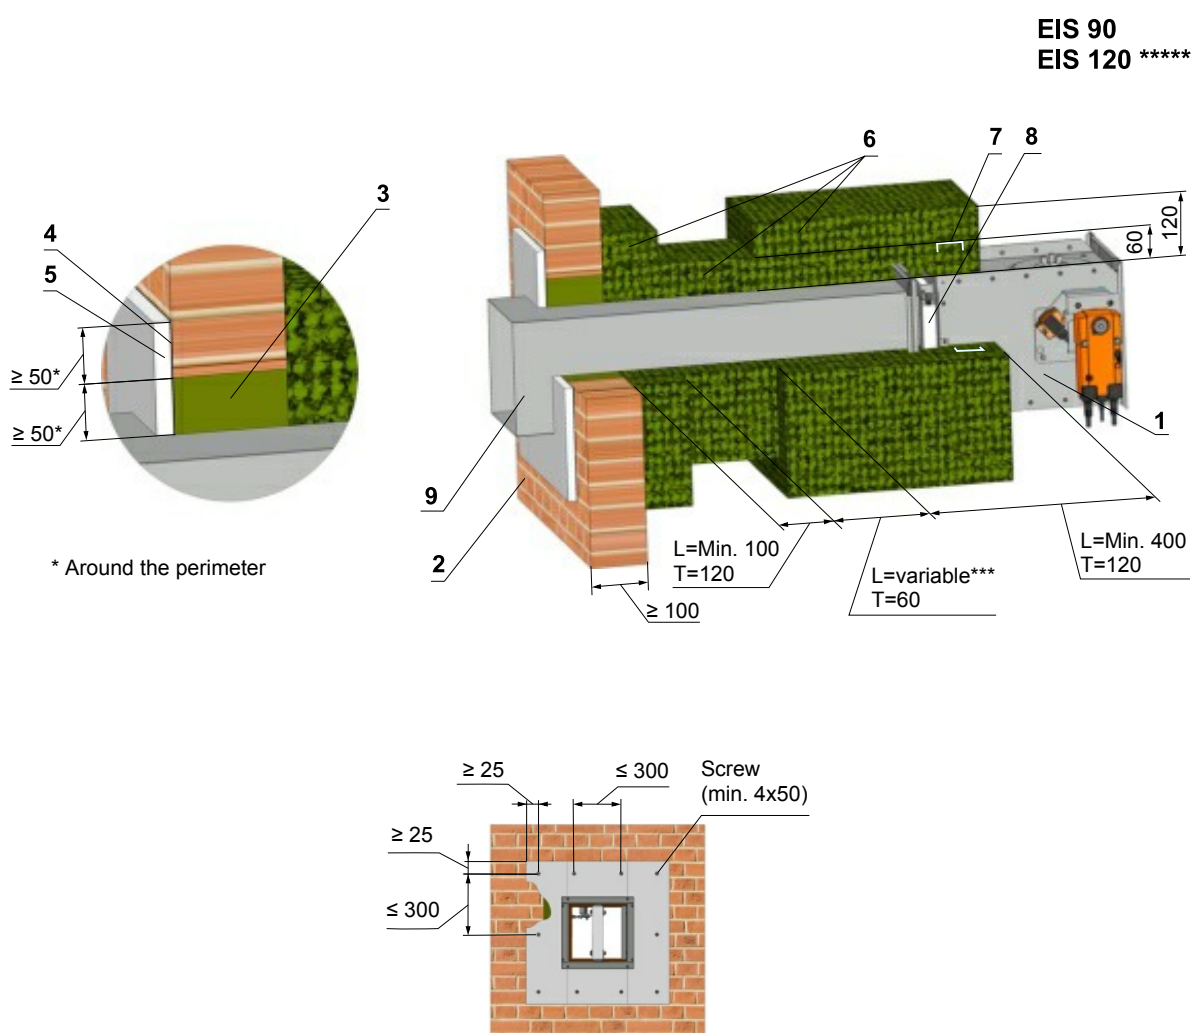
Outside solid wall construction - mineral wool, stuffing box, fire protection mastic and cement lime plate
